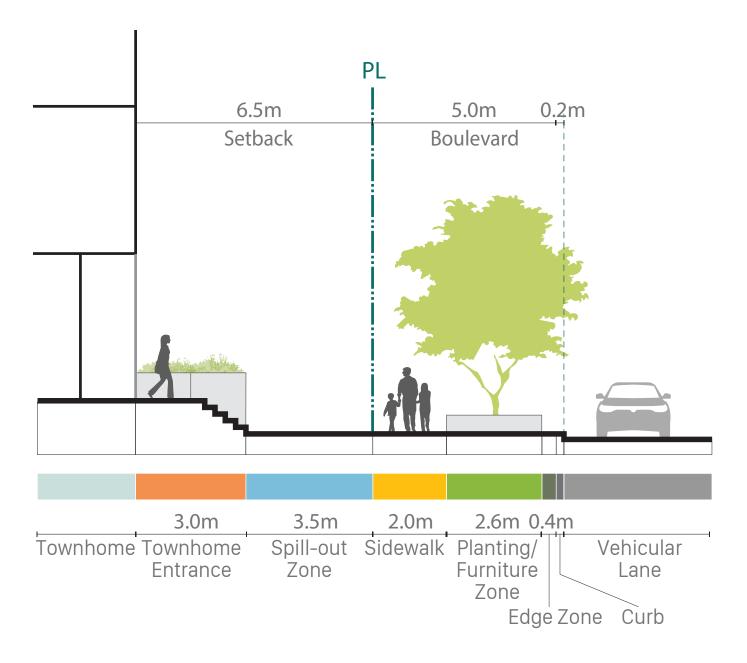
Section at interface of Subject Site and Hawkins Drive (Courtesy of SvN Architects + Planners)
